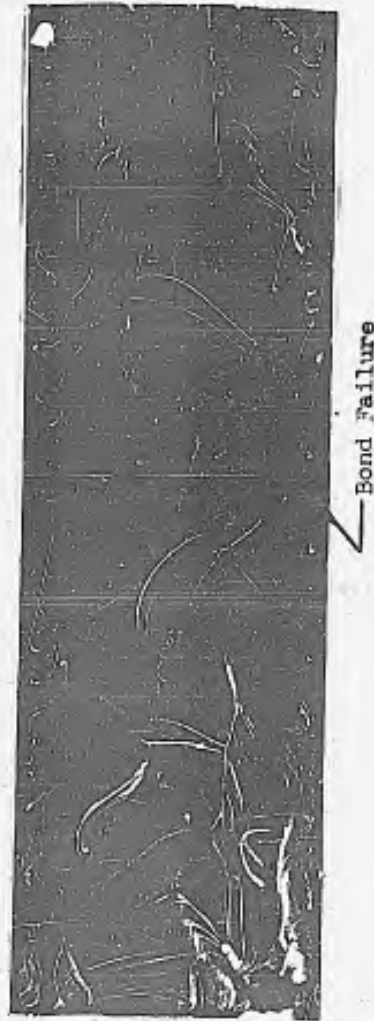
CHIPPING FAILURE IN FULLY TEMPERED GLASS—TYPE 6A FAILURE
